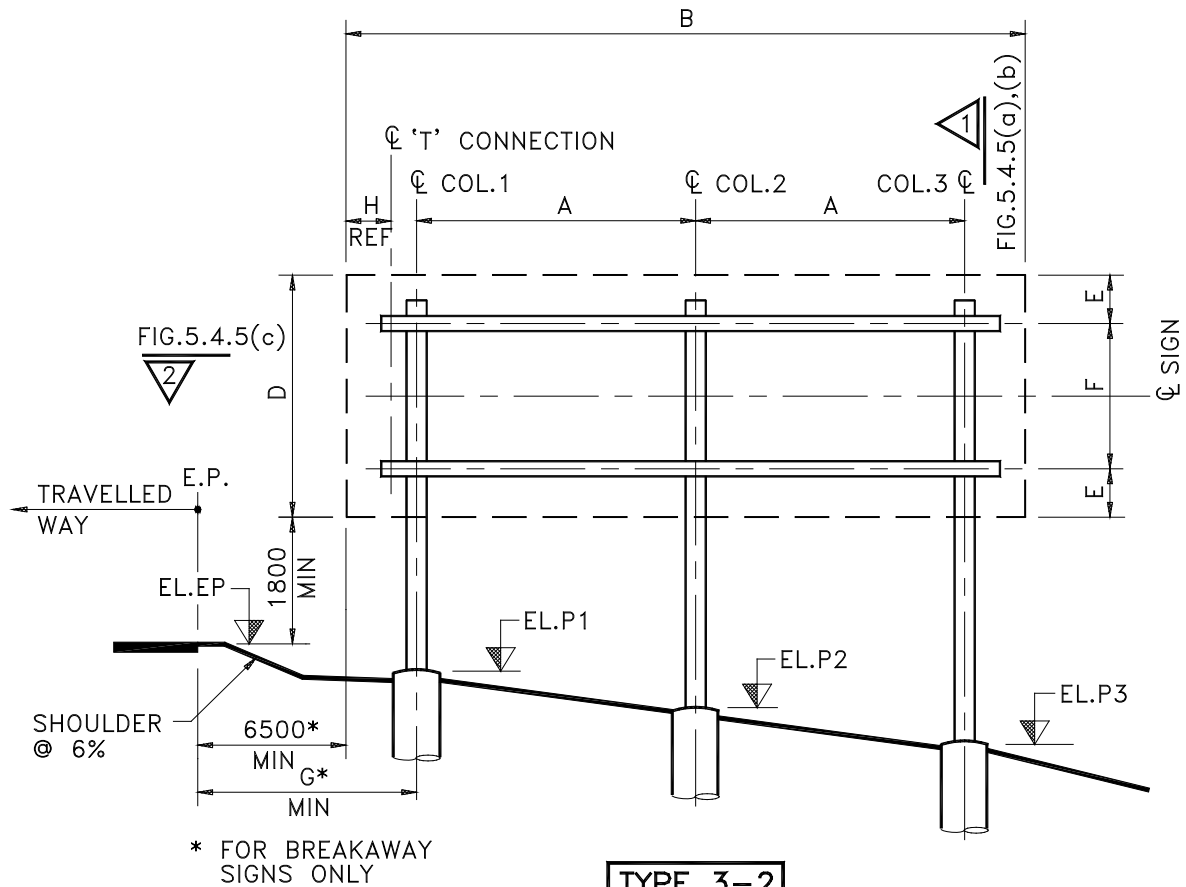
(b) ASSEMBLY AND INSTALLATION DIMENSIONS
